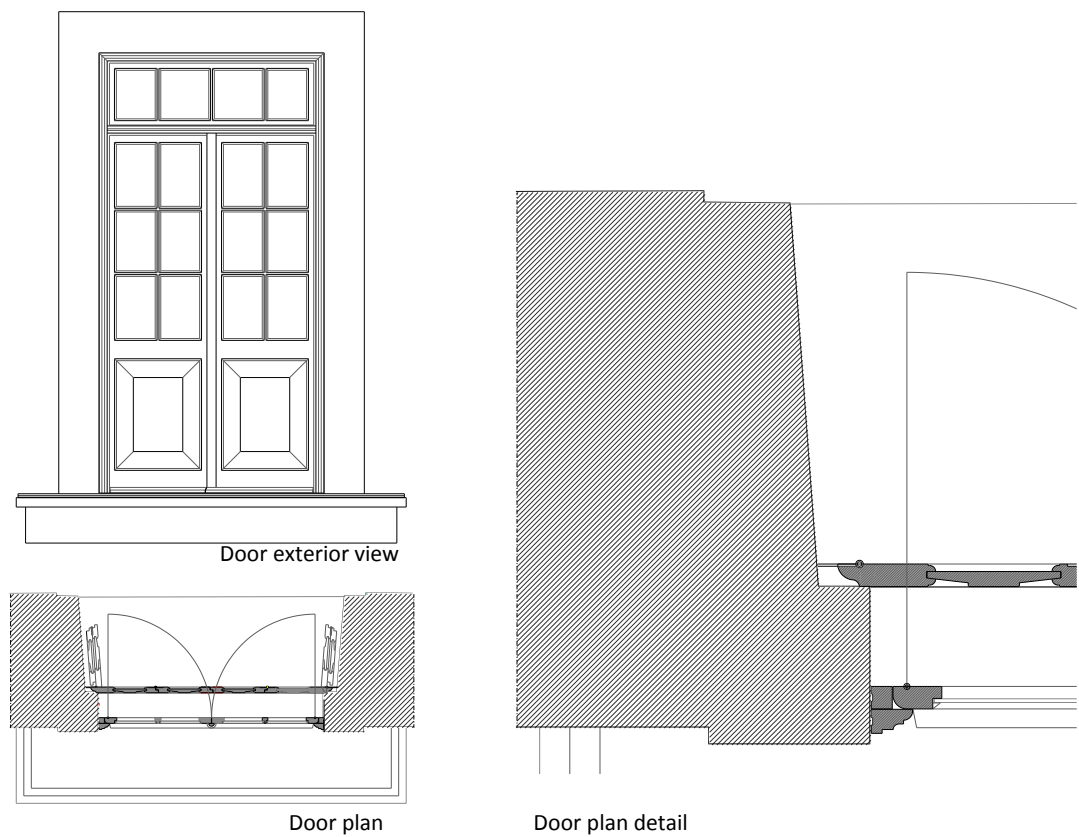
Exterior view, plan and detail of the traditional balcony door with inner shutters.
